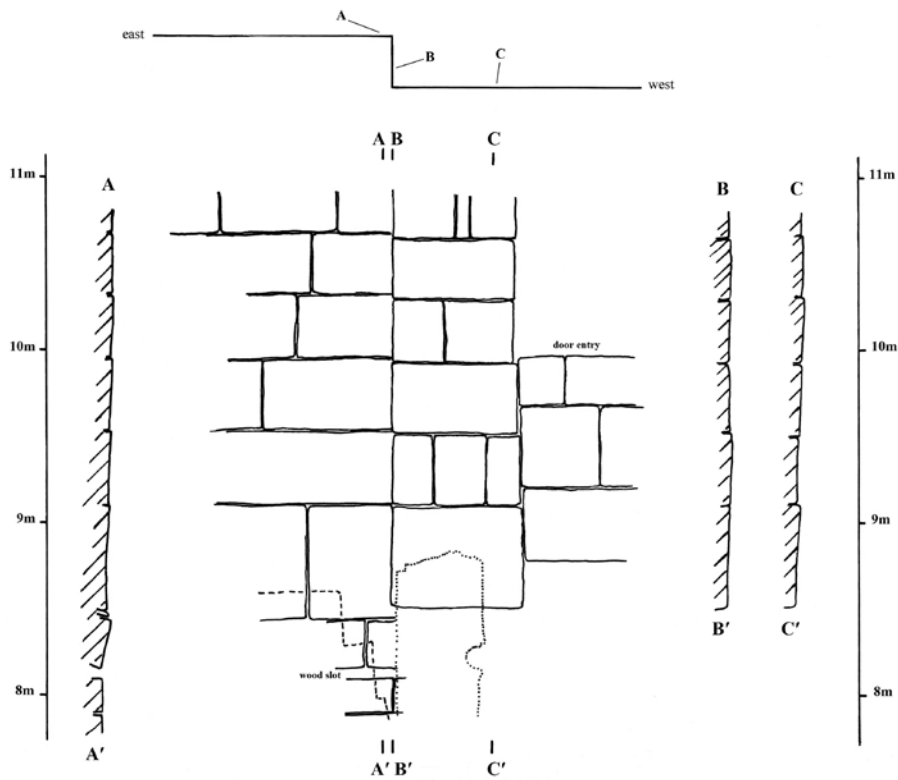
Schematic cross-section of the north wall at the central doorway.
